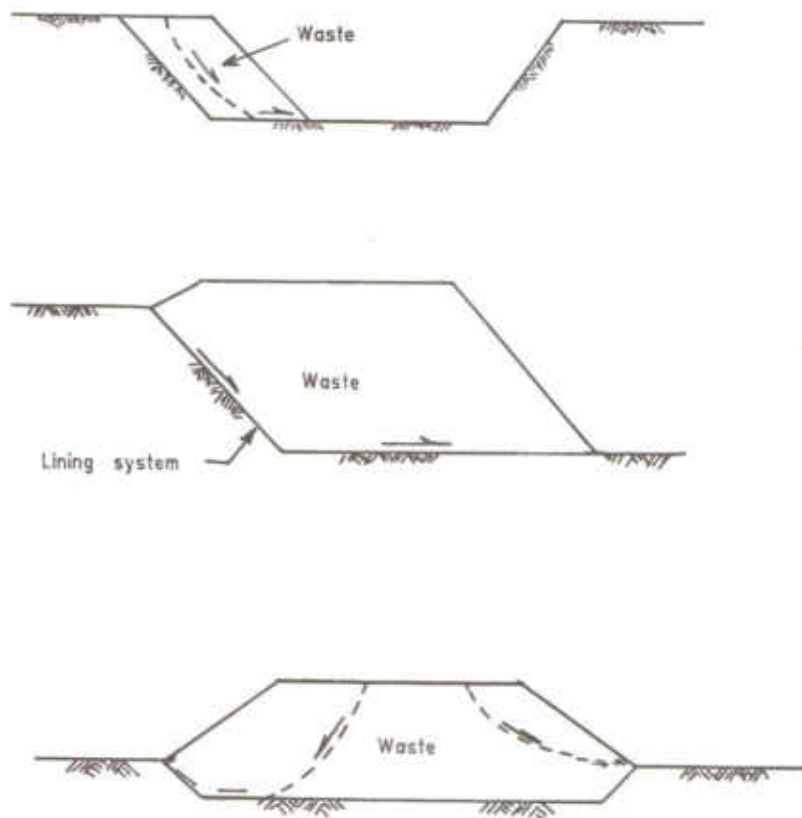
SOME TYPICAL FAILURE MECHANISMS FOR SLOPES IN LANDFILLS
